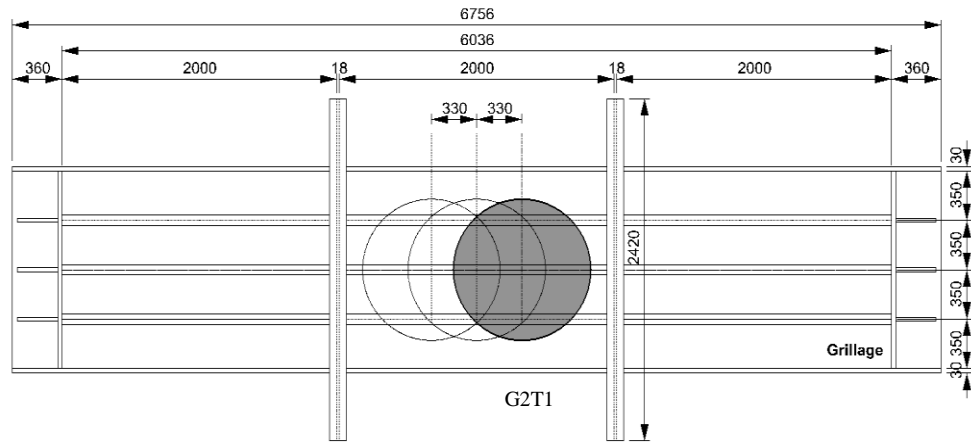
The first test of Grillage #2 (G2T1) - right off-centre loading case
